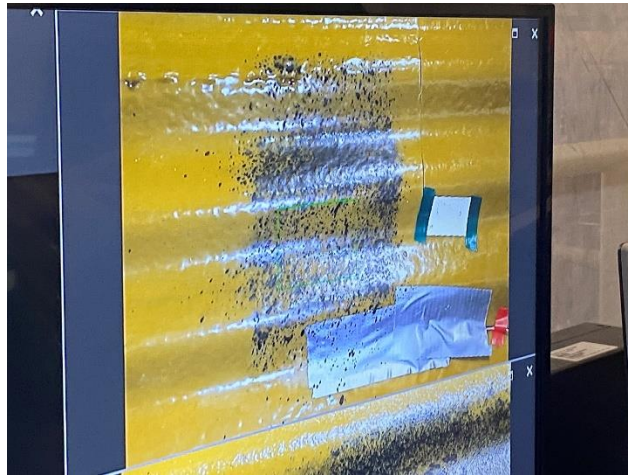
Appearance of the 1st crack in the lined CMP for 0.25 in. thick liner (Source: CUIRE Laboratory)
